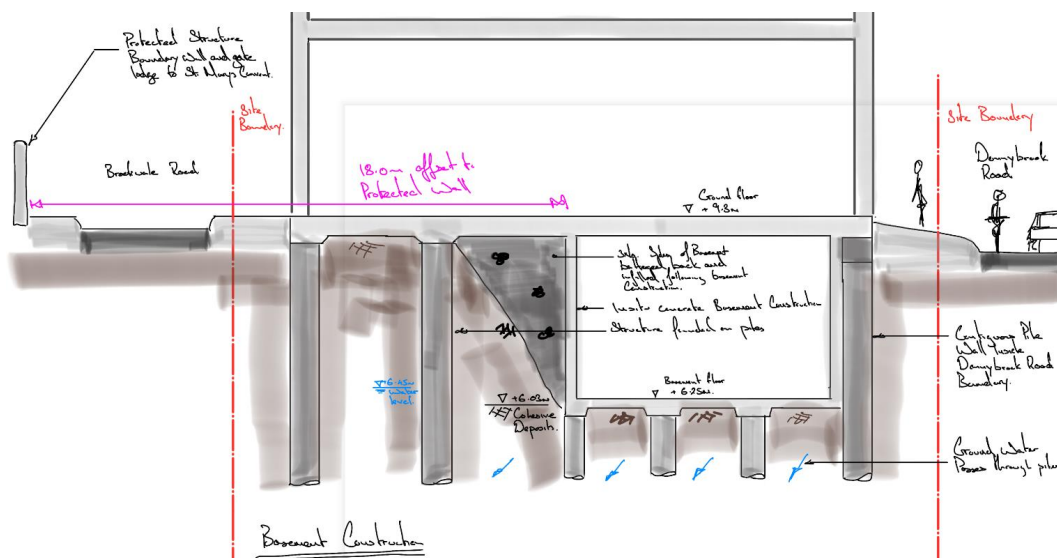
Basement cross section sketch indicating relationship of construction with the Brookvale Road boundary wall to St. Marys Convent (from CORA Consulting Engineers Basement Impact Assessment report)
